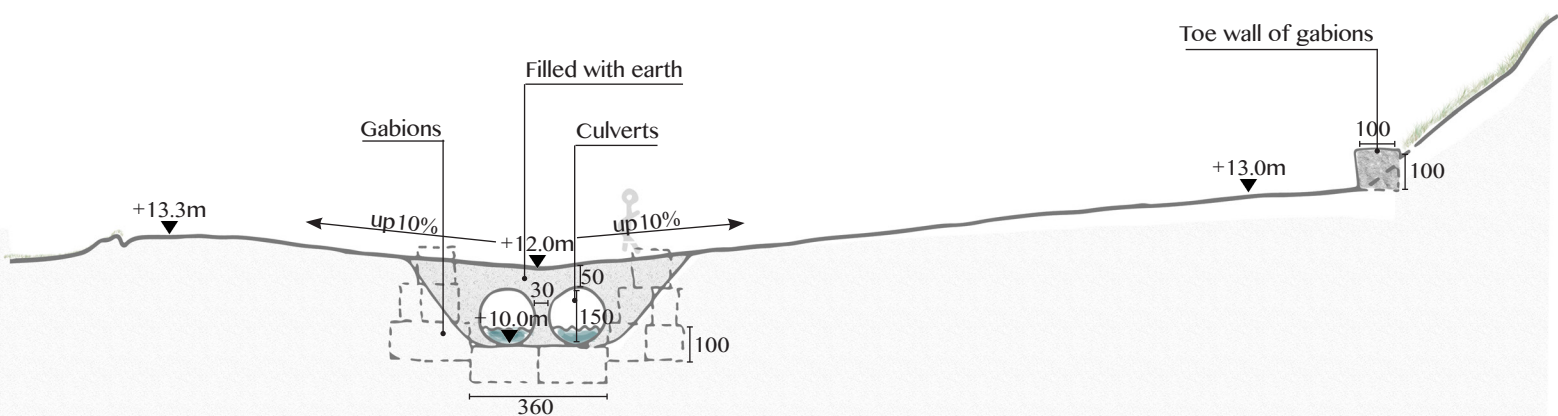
Section F-F' Culverts bridge, scale 1:200, dimensions in cm
